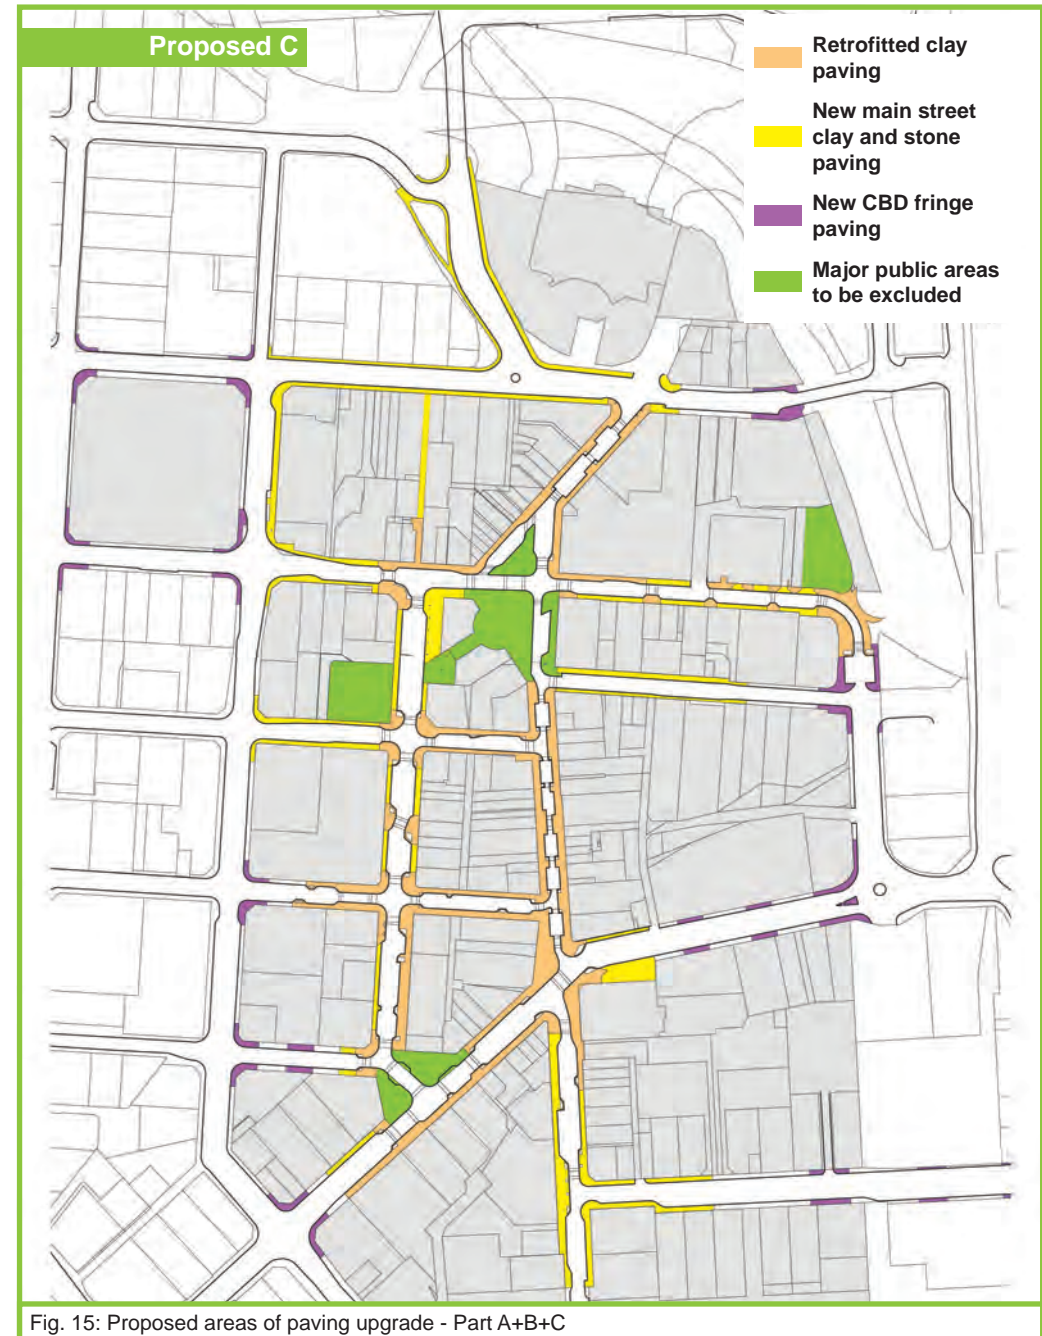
Proposed areas of paving upgrade - Part A+B+C
